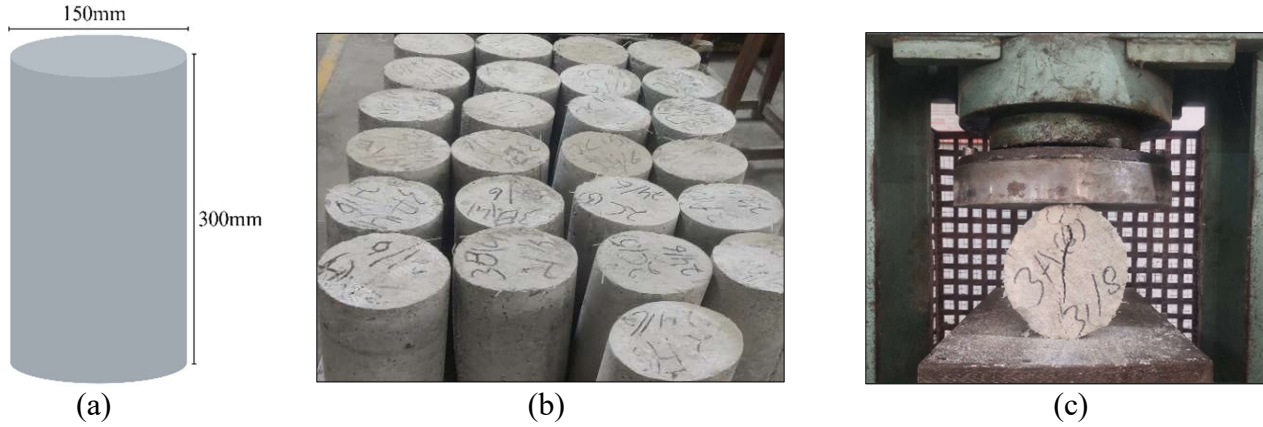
(a) Concrete cylinders dimensions (b) Casted samples (c) split tensile testing
